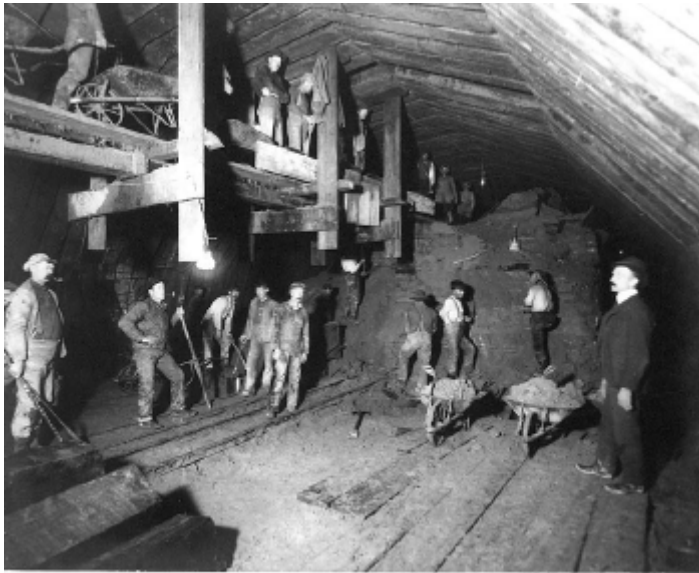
Excavation of the Upper Heading of the Great Northern Railroad Tunnel Beneath Downtown Seattle (photo courtesy of the University of Washington Photo Archive).
